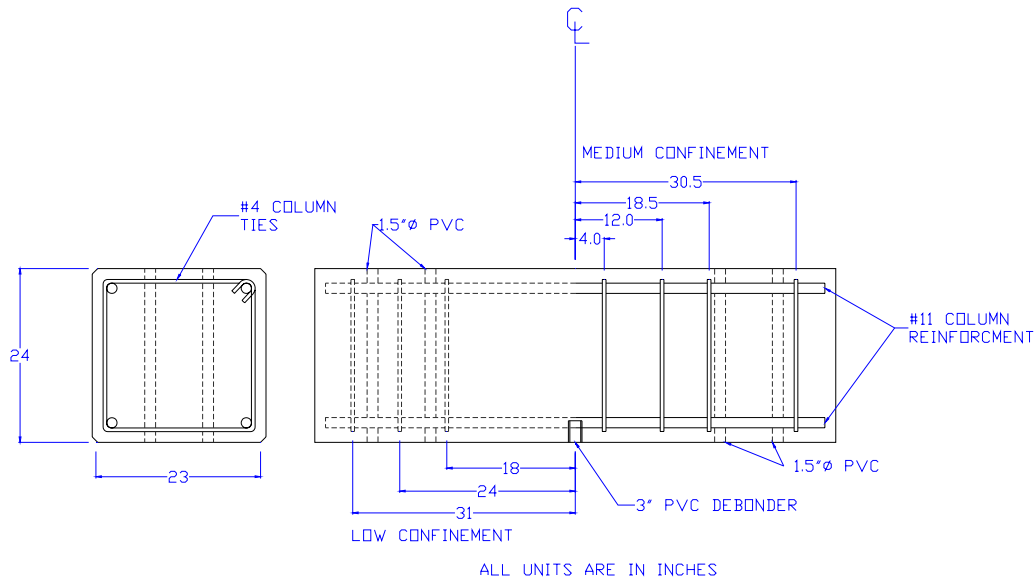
Typical column reinforcing details for all specimens, both low and medium stirrups
